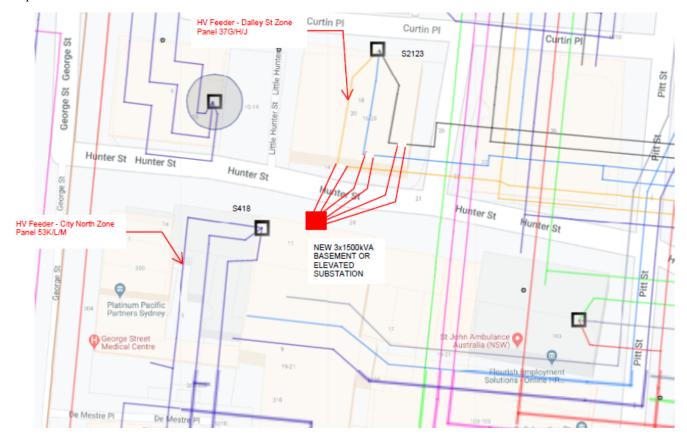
Proposed preliminary HV arrangement of substation interconnected to triplex network (6x300Cu1/Triplex cabling).
